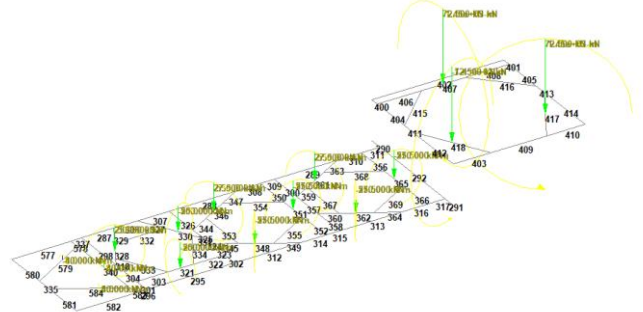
Equipment Dead load at plan 9.8 and 11.8 m
